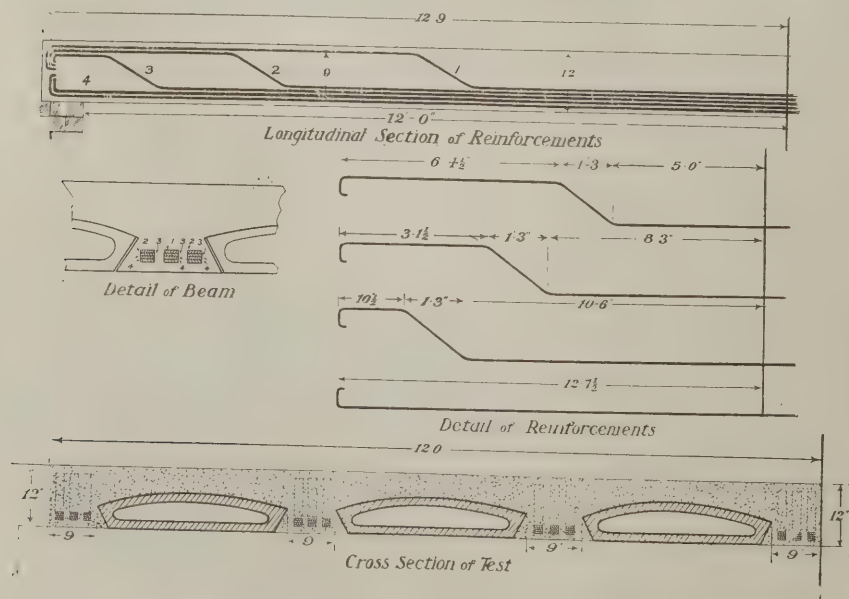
DETAILS OF FLOOR UNDER TEST.
